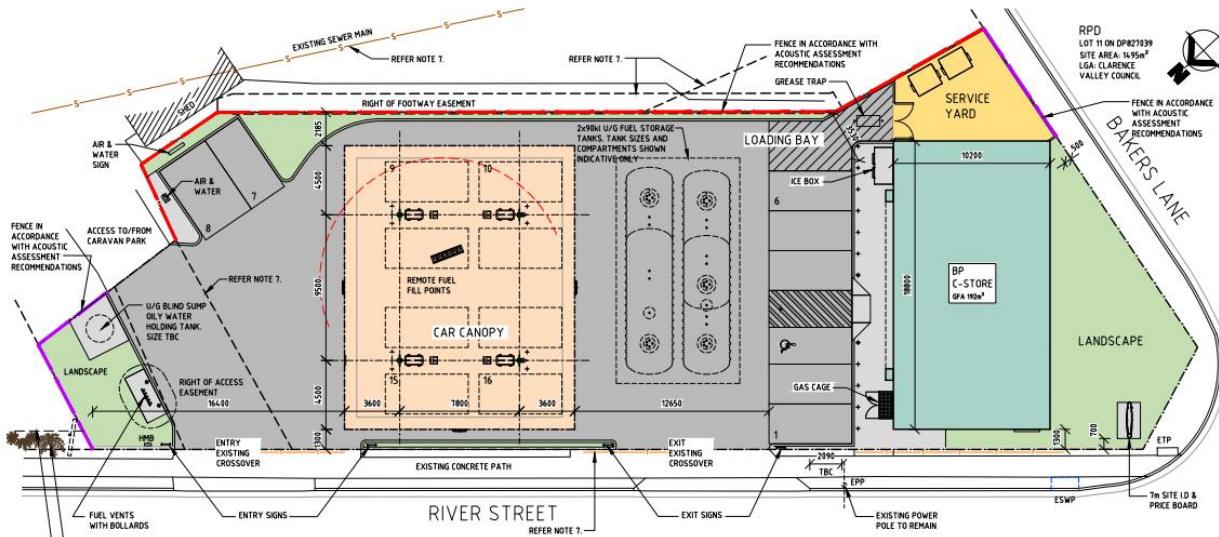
Extract of proposed site plan showing proposed service station layout including sections of boundary fencing to be upgraded (coloured red and purple), fuel vent location (bottom left) and related features.
